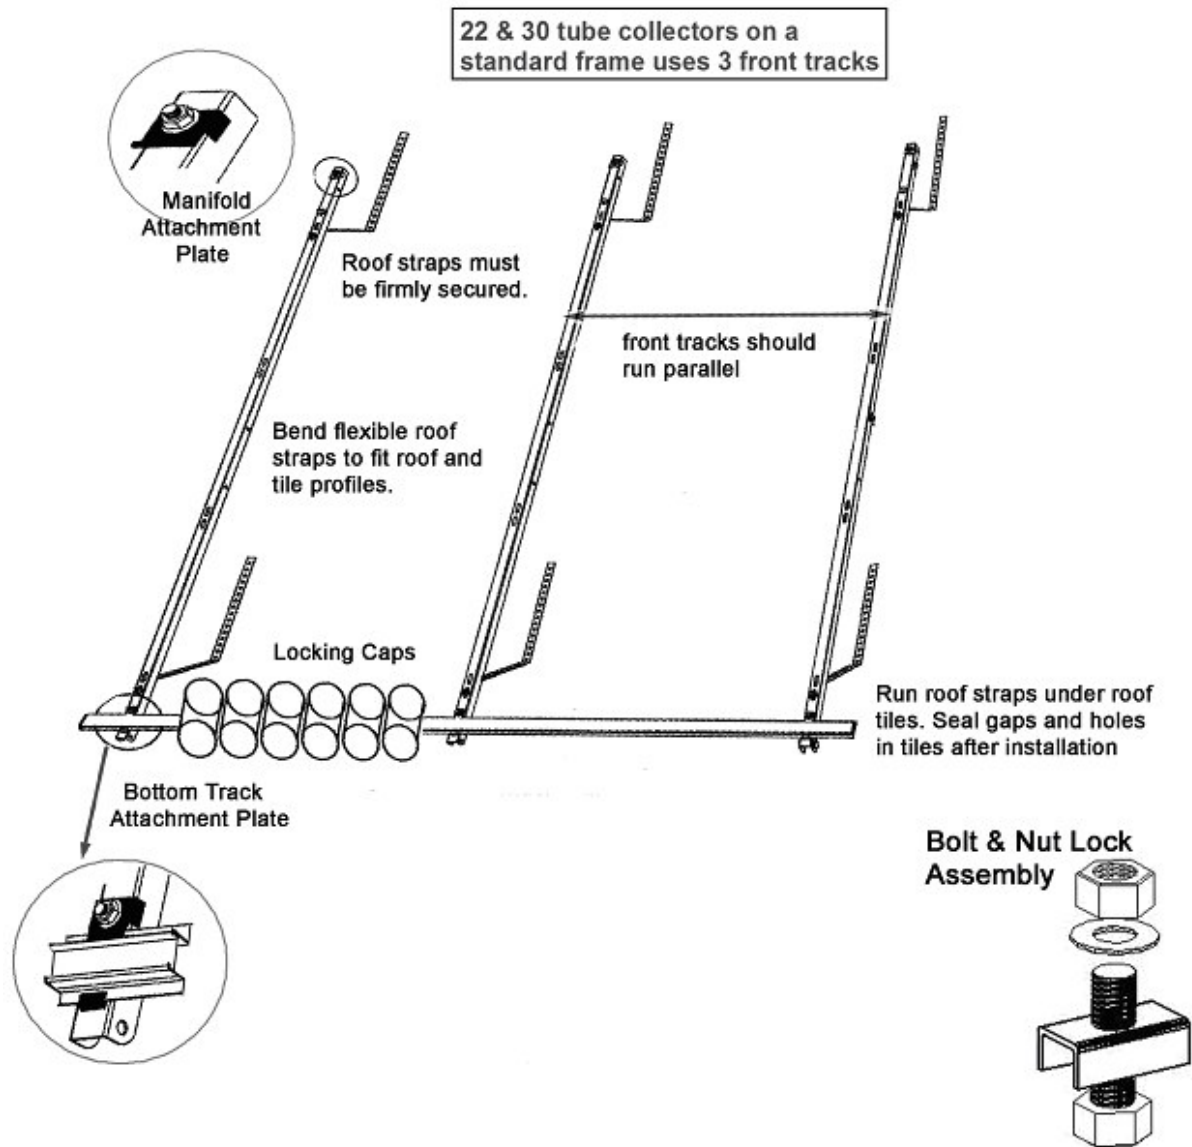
Standard 22 and 30 tube frame assembly for tiled roof
